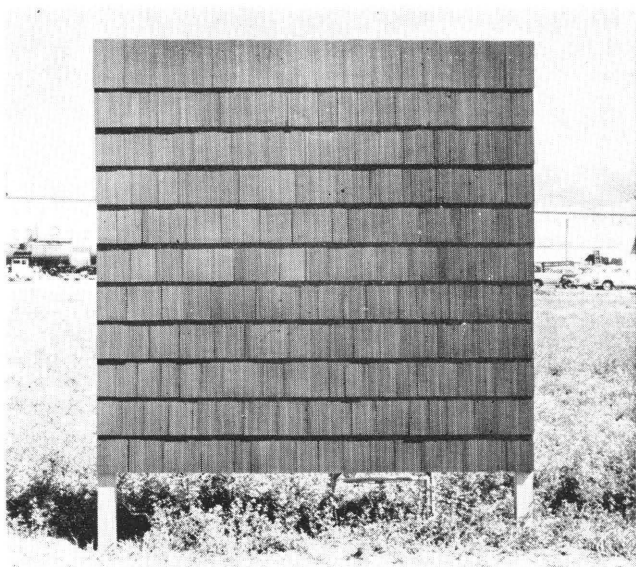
A demonstration of the ability of the lumber-paper sheathing panel to hold side wall shingles.
